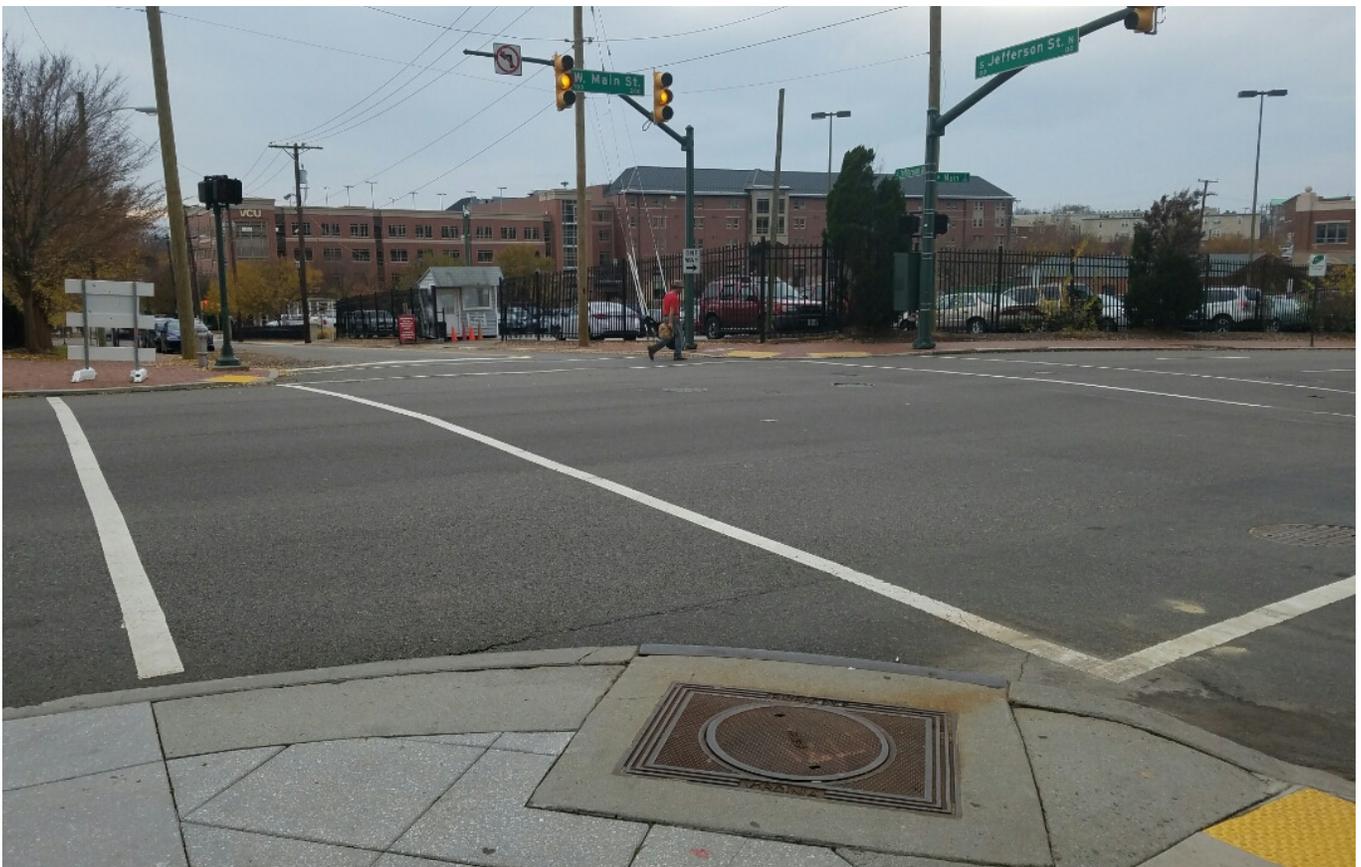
Missing curb ramp on the intersection of Main Street and Jefferson Street
